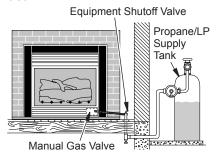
Checking Gas Joints (Propane/LP Gas)
